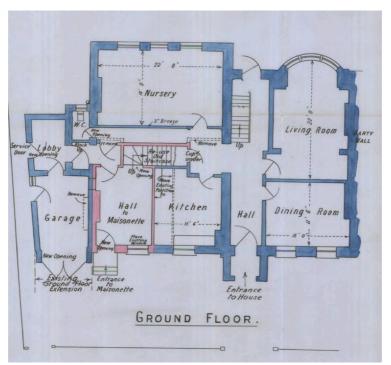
1946 Ground Floor Plan of 7A Subdivision Works
